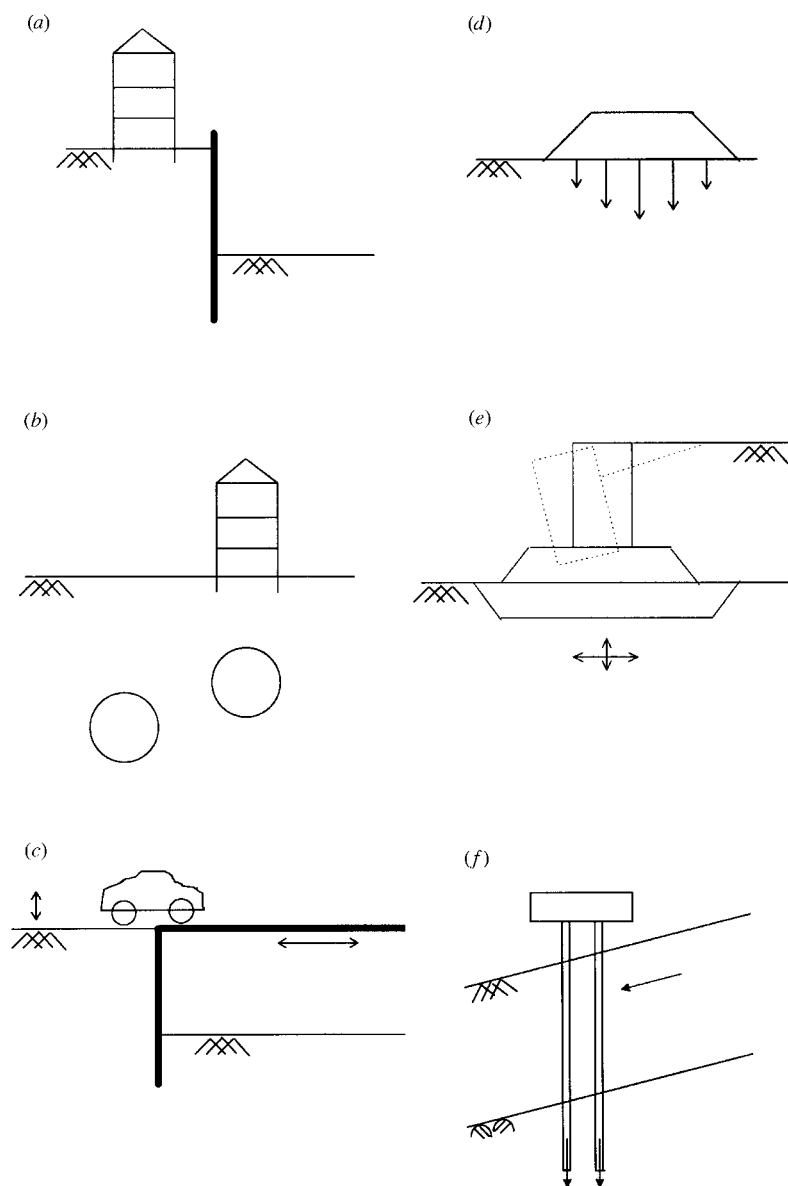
Typical geotechnical problems. (a) Deep excavation beside existing building: small deformations caused by movement towards excavation. (b) Tunnels beneath existing building: small deformations caused by ground loss during tunnelling. (c) Integral bridge abutment: small deformations but repeated loading both from traffic and thermal expansion of bridge deck. (d) Embankment on soft alluvial ground: medium deformations caused by plastic deformation of foundation soils. (e) Failure of quay wall through earthquake induced liquefaction: large deformations at failure (final position of wall shown with dotted line) produced by horizontal and vertical accelerations of foundation soils (see Inagaki *et al.* 1996). (f) Structure supported on piles to rock through unstable slope or creeping landfill: large deformations caused by downslope movements of artificial or natural materials.
